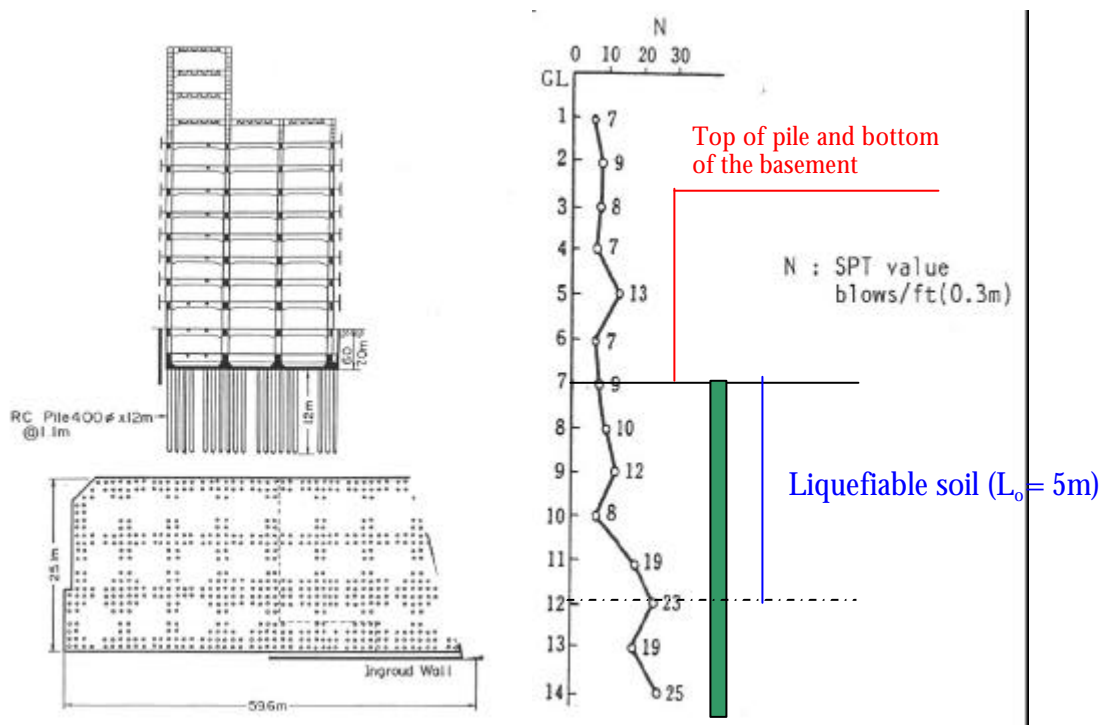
The structural arrangement of the 10-storied piled building along with the soil profile (after Hamada, 1992a).
